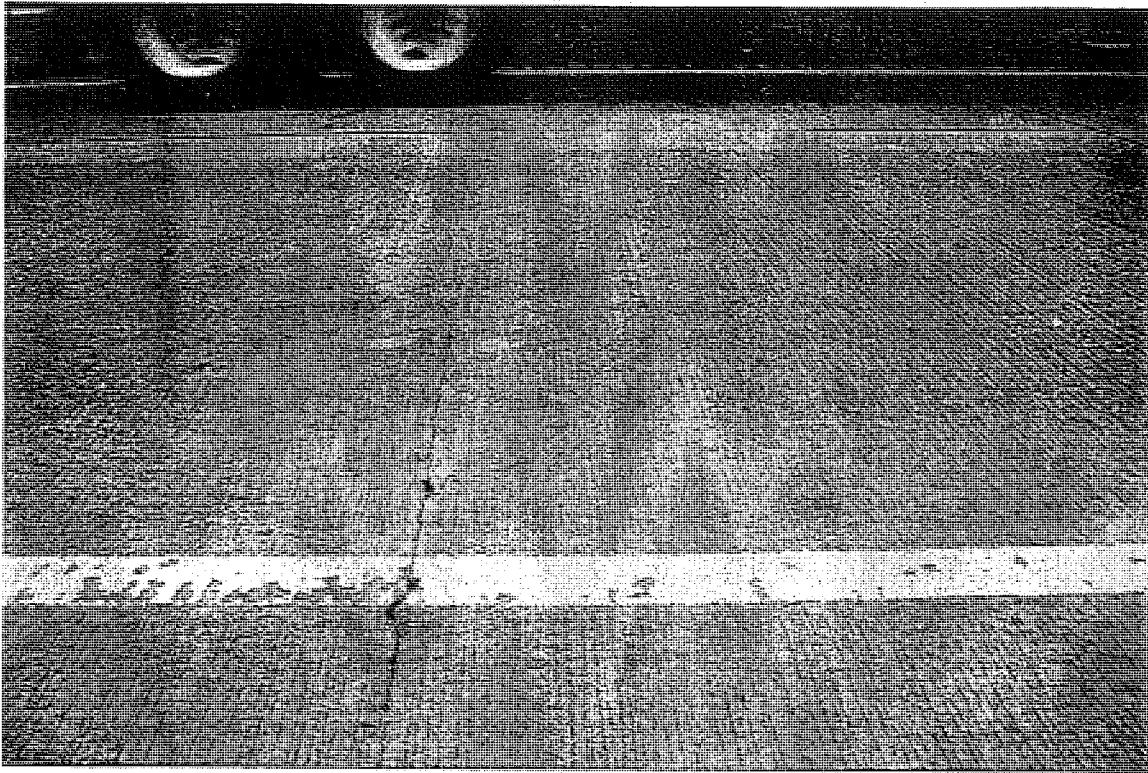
A close-up of a full width transverse crack in CSN# 11017-32516A (Section C), EB. The beginnings of spalling can be seen at the bottom of the photo.
